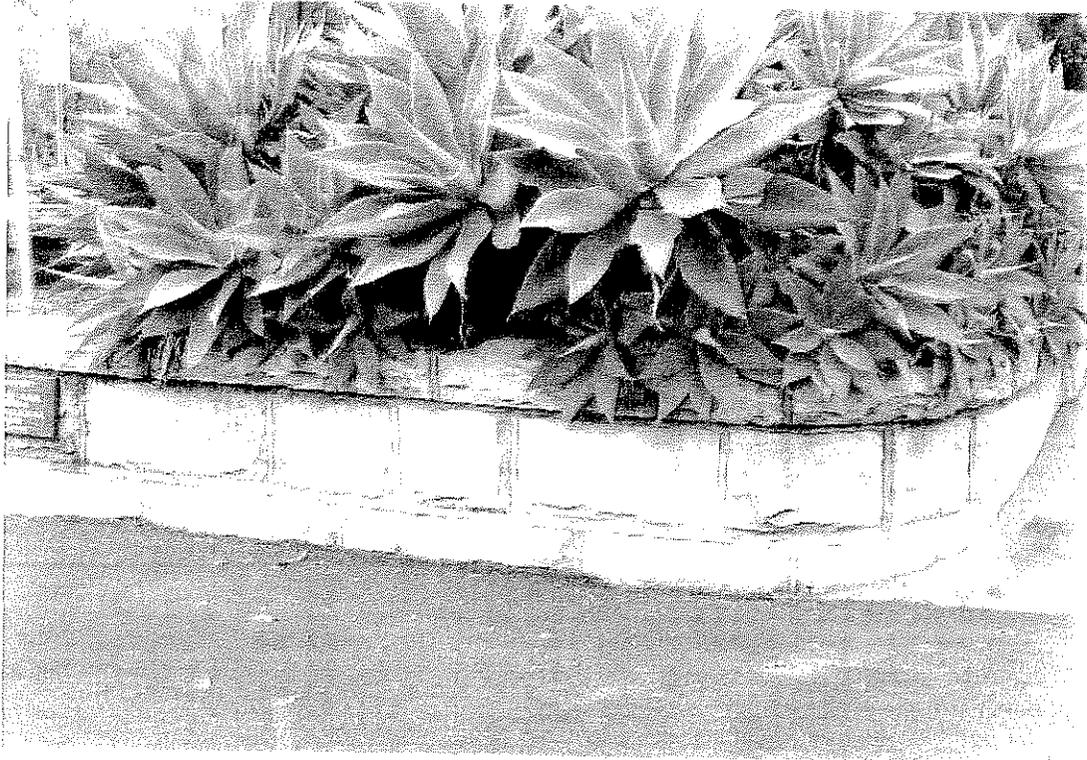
Detail of sandstone perimeter wall and landscaping at driveway entrance on De La Guerra Street. Facing west. A. C. Cole. July 2006
